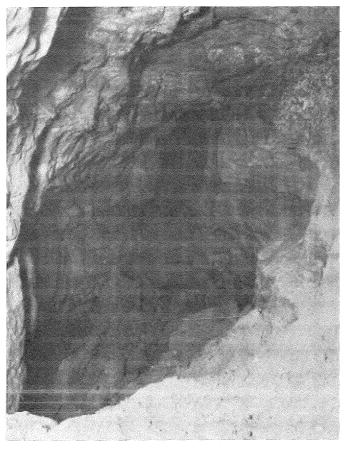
Cavity near bottom of Excavation No. 3 after digging farther into wall of trench. Cavity is sufficiently large for man to enter.
